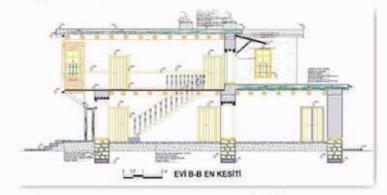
Cevdet Paşa Paşa B-B Longitudinal section (Ş. ÖZTÜRK)
